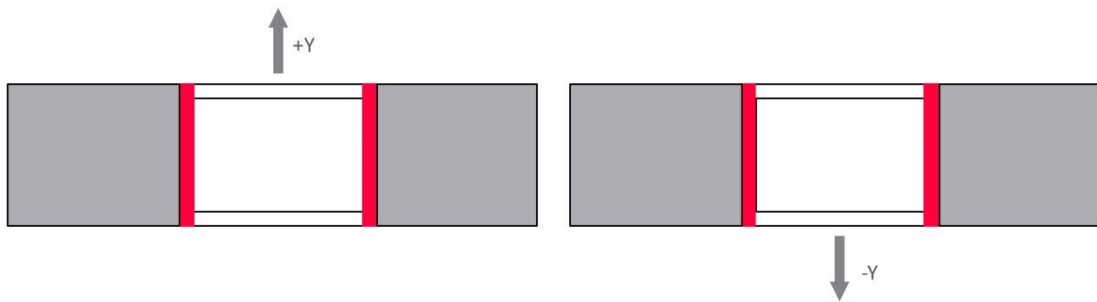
3: In the case above, only the direction +Y and -Y should be evaluated because walls perpendicular to loading direction +X and -X are not likely to fail out-of-plane because of the presence of an adjacent building (plan view)
